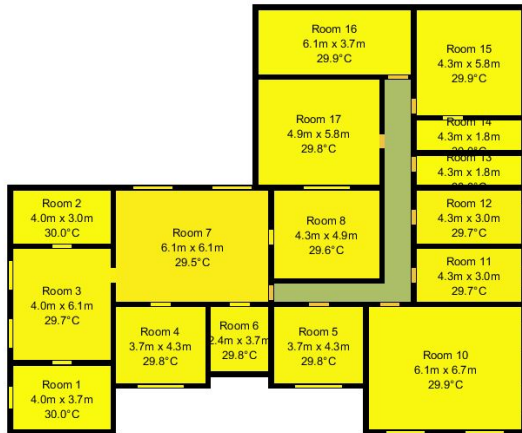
LARGE SIZE HOUSE LAYOUT.
